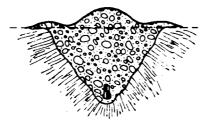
Cross section of typical crater in rock, showing nomenclature.
